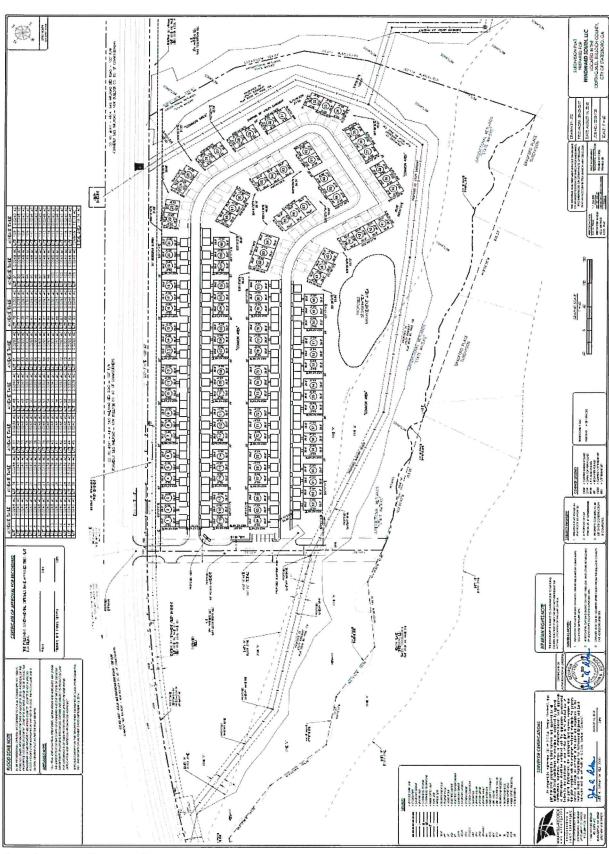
EXHIBIT G: REVISED SITE PLAN W/ FEE SIMPLE LAYOUT (DATED: AUGUST 15, 2018)
